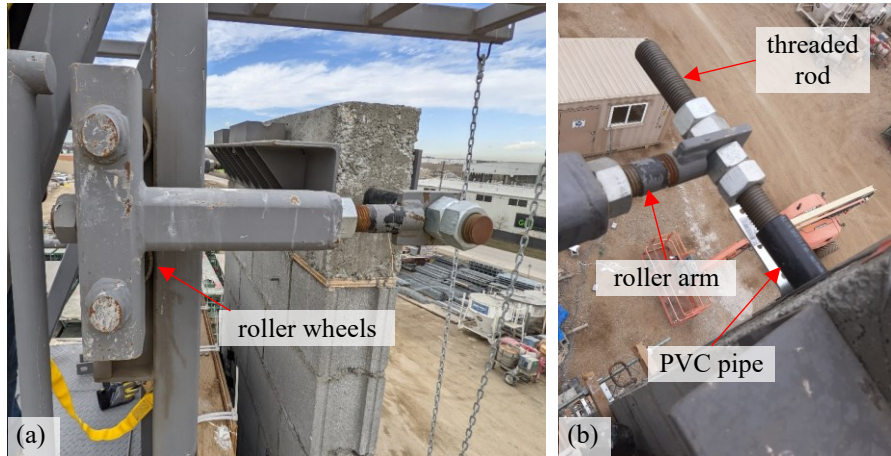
Top support system (a) Roller installed on each side of the structure (b) Threaded rod protruding from each side of the concrete beam.
